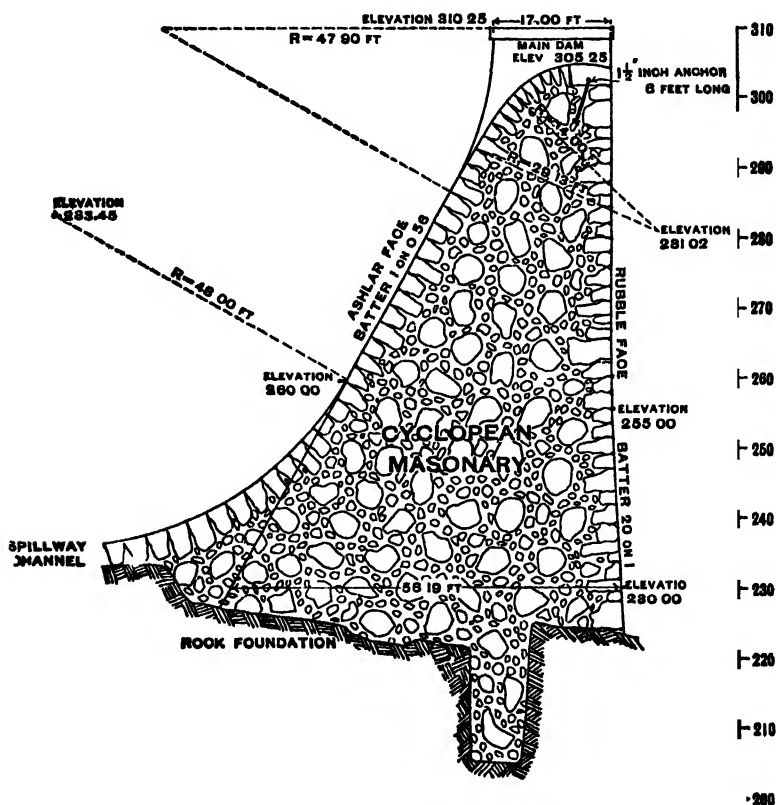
Section through Overflow of Boonton, N. J., Dam. (See p. 676)
